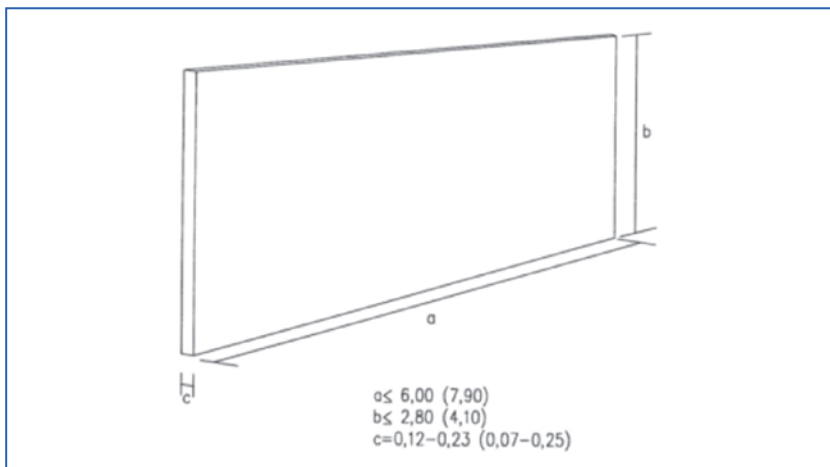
Homogeneous on-site cast concrete separating wall.
